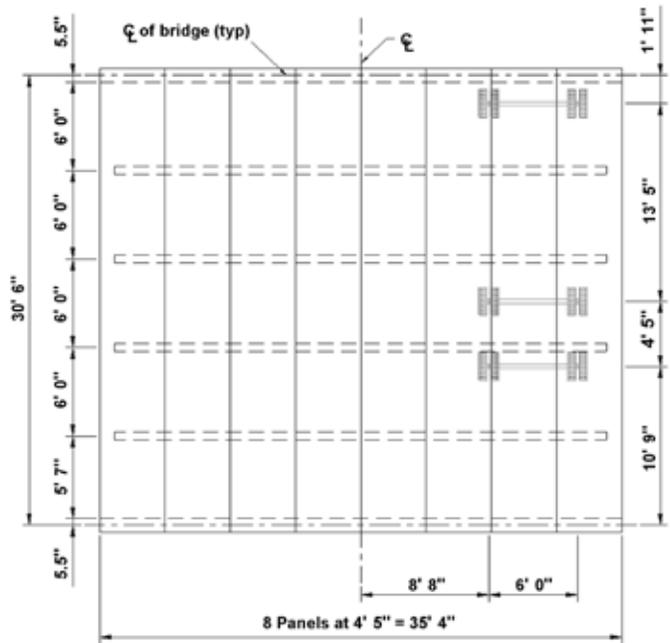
Controlling load position for East Main Street Bridge, plan view.
